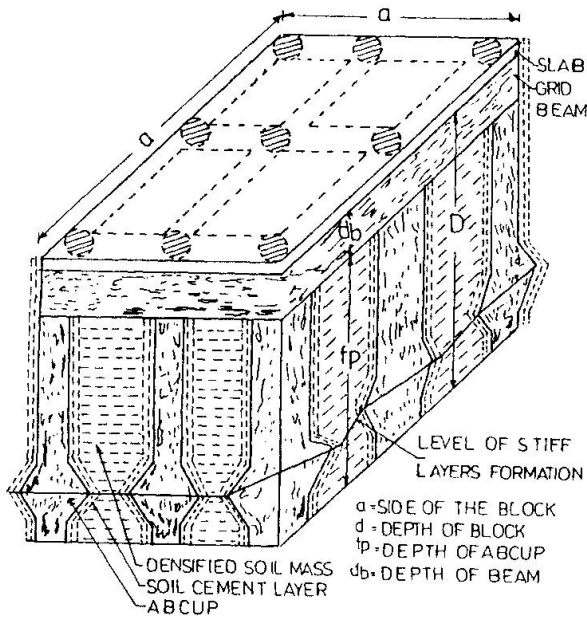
CIDF SYSTEM AS BLOCK FOUNDATION
